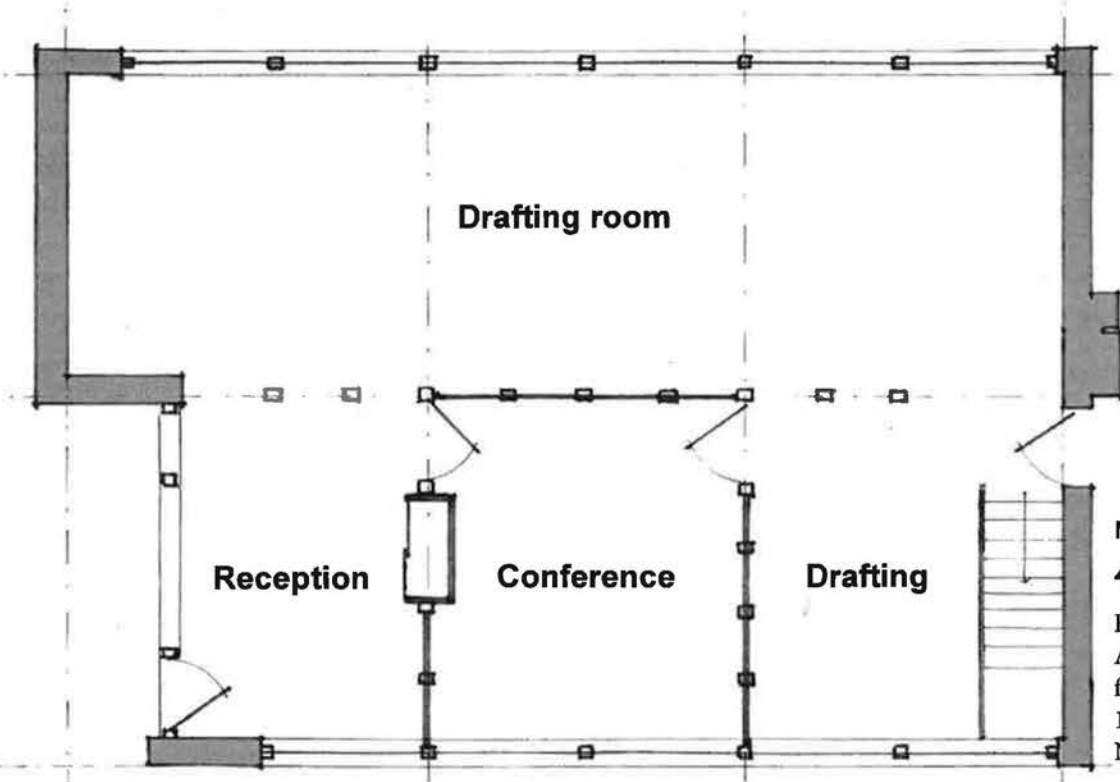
Wells-Denbrook Architectural Office main floor studio plan, original 1954 layout. Not to scale
